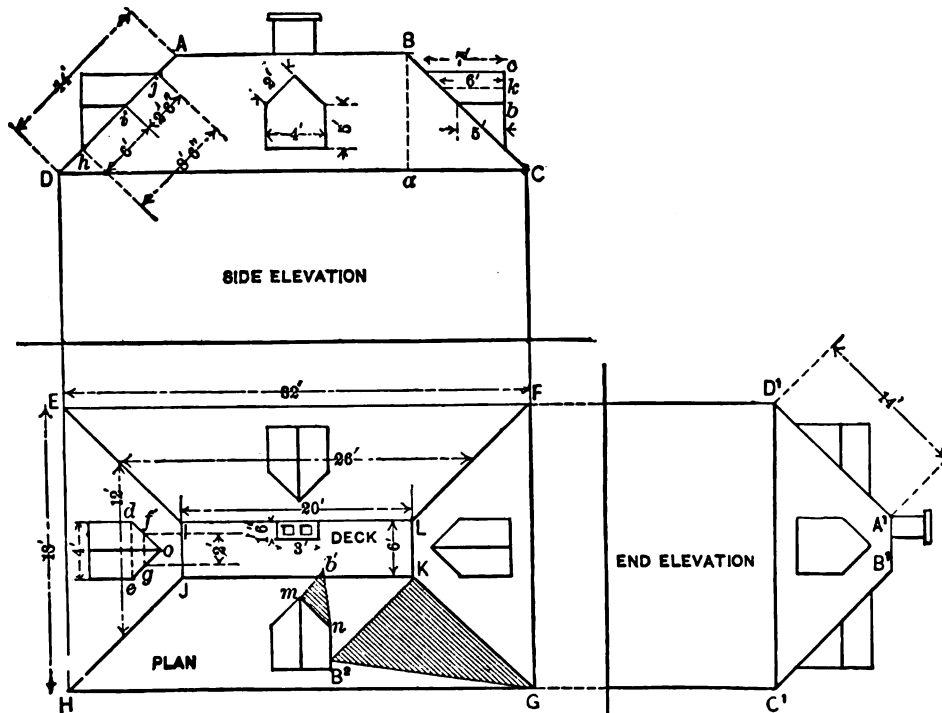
Plan and Elevation of Mansard Roof with Deck and Dormers
